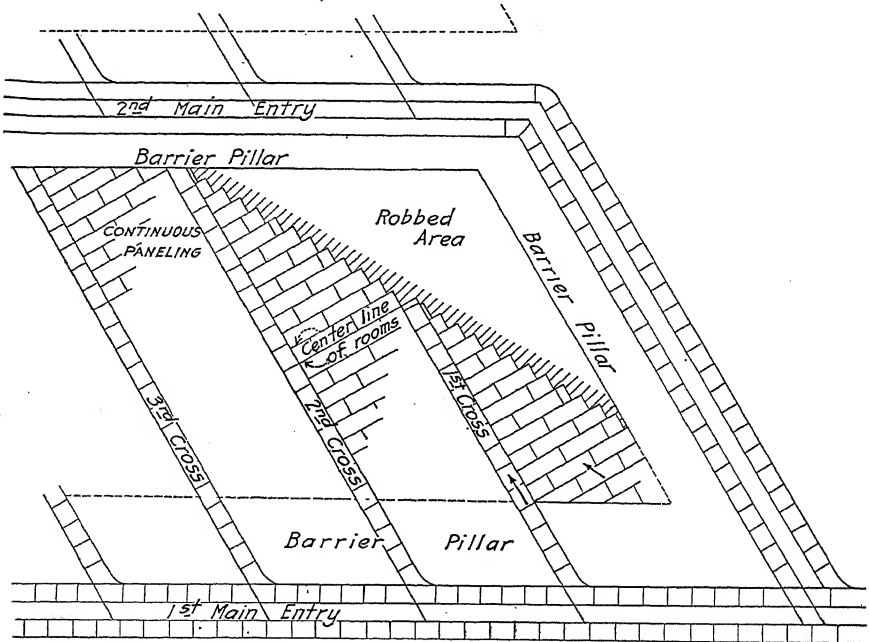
TYPICAL PLAN OF MINING ON THE PANEL SYSTEM.
